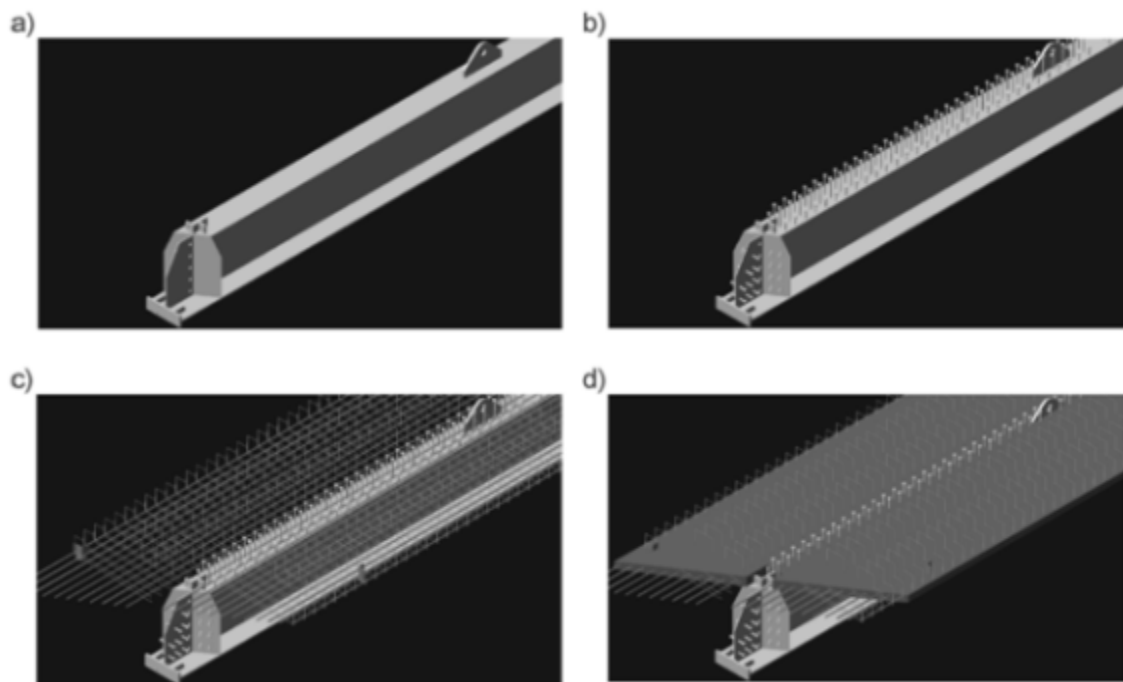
VFT prefabrication phase: a) welded plate girder, b) carrying out of different height studs, c) prefabricated unit reinforcement laying, d) prefabricated flange cemented.
